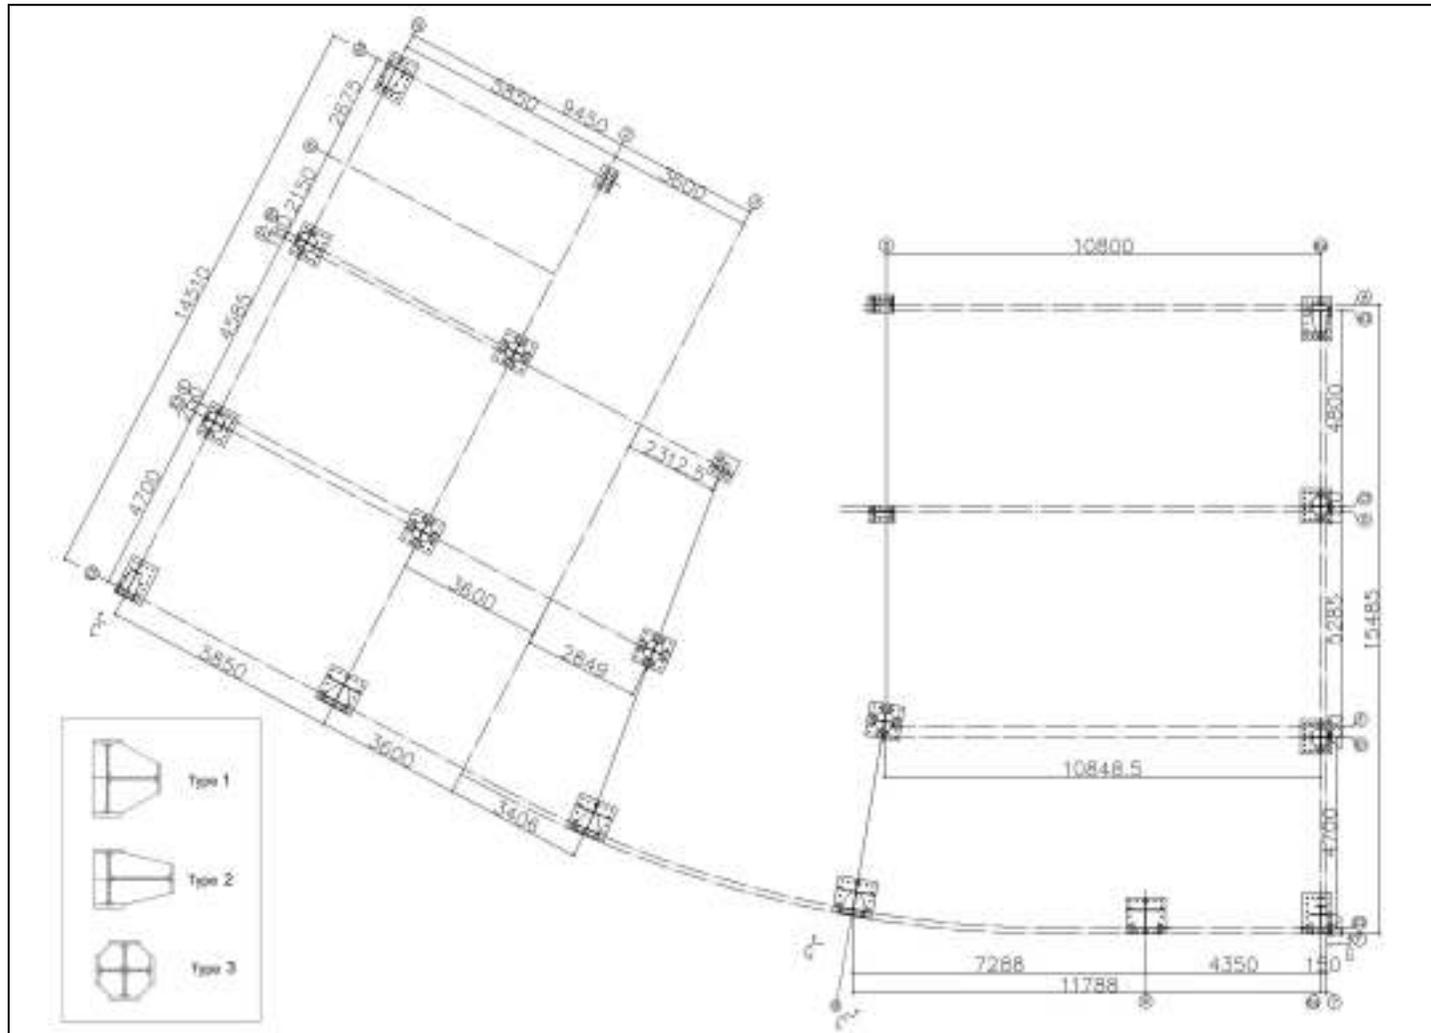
Structural plan showing location and sizes of columns and beams (Source: Rona Mühendislik)
